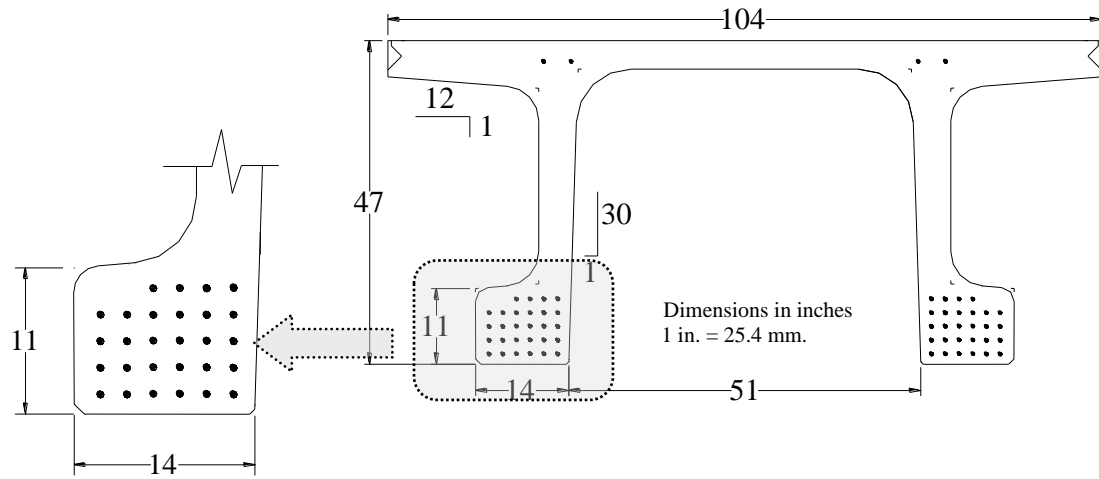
Strand layout of 47-inch-deep section for 135-foot (41.1 m) span
